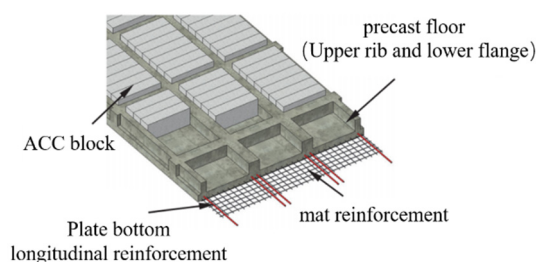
Steel mesh cement floor-autoclaved aerated concrete composite floor
